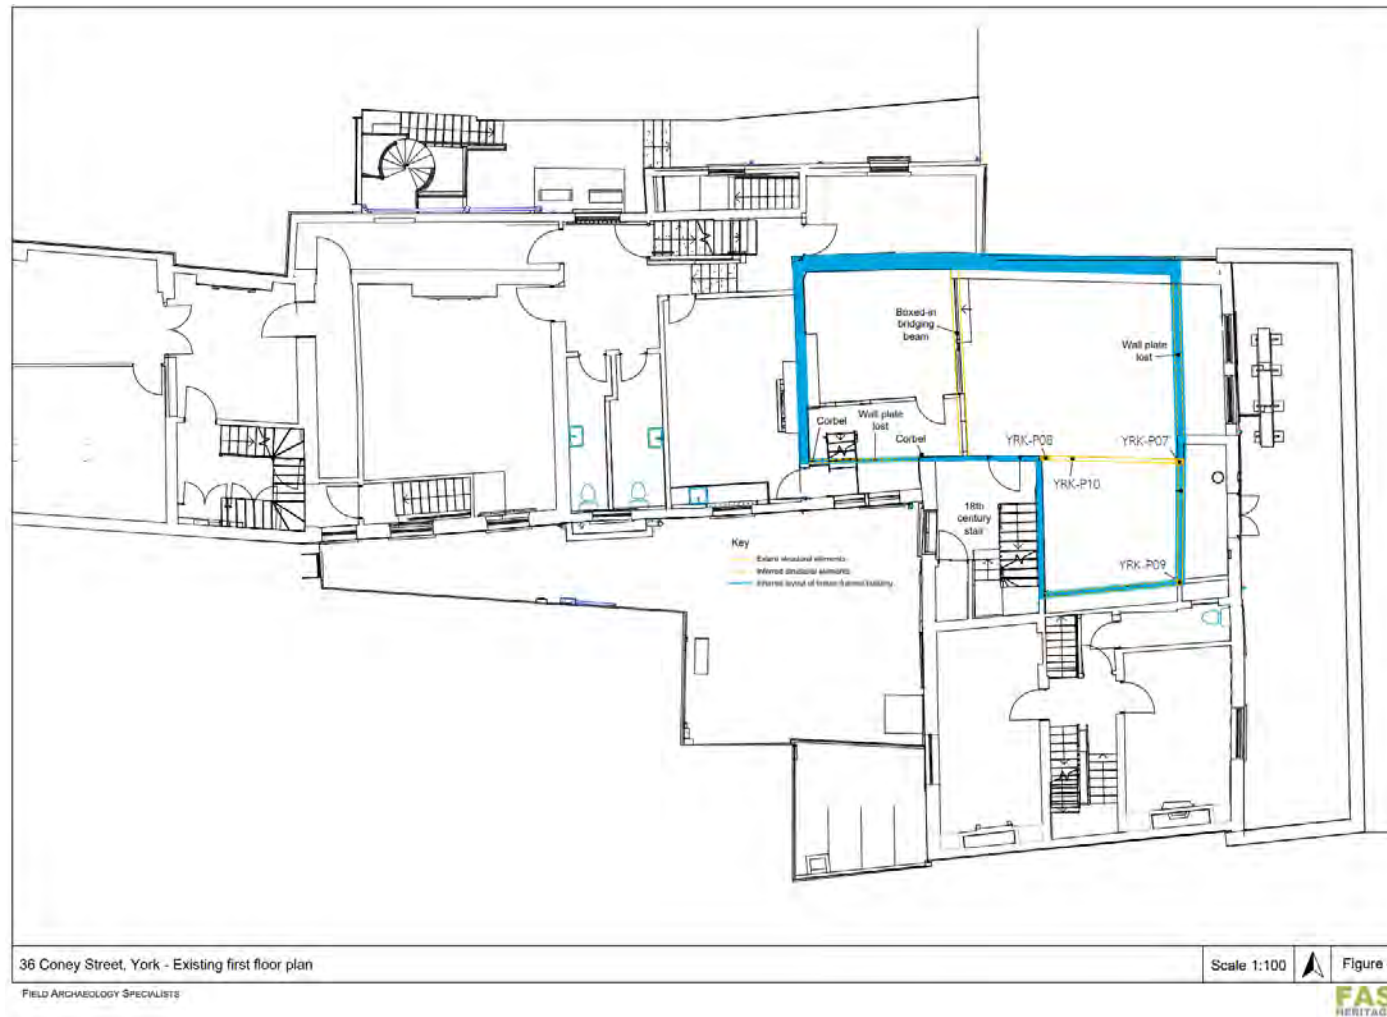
First-floor plan, showing the location of samples YRK-P07–10 (FAS)
